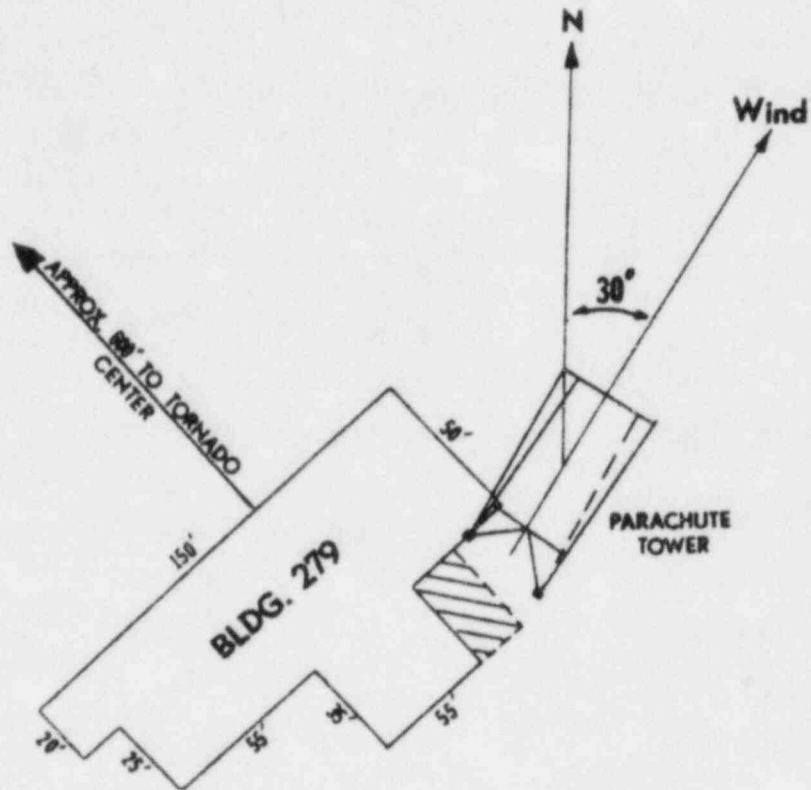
PLAN VIEW OF THE PARACHUTE TOWER AT BUILDING 279
